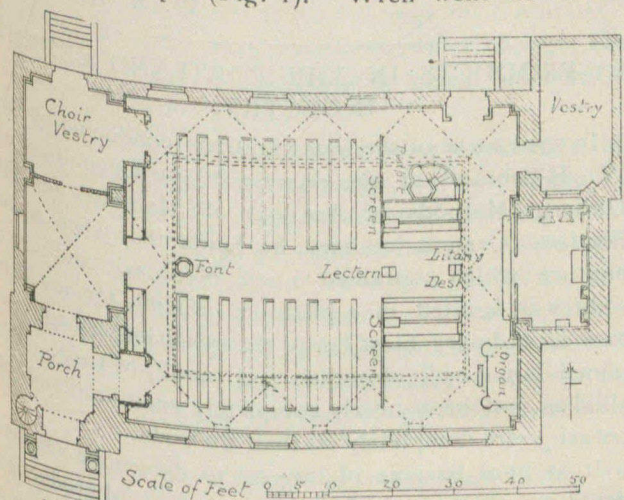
PLAN OF ALL HALLOWS, LOMBARD STREET.
